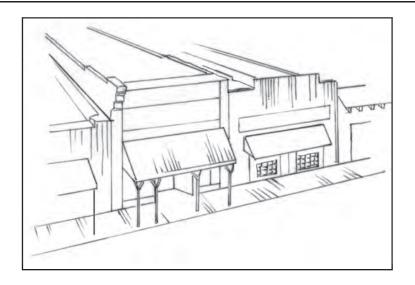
Continuity of Building Form and Mass with open, façade Roof Type
